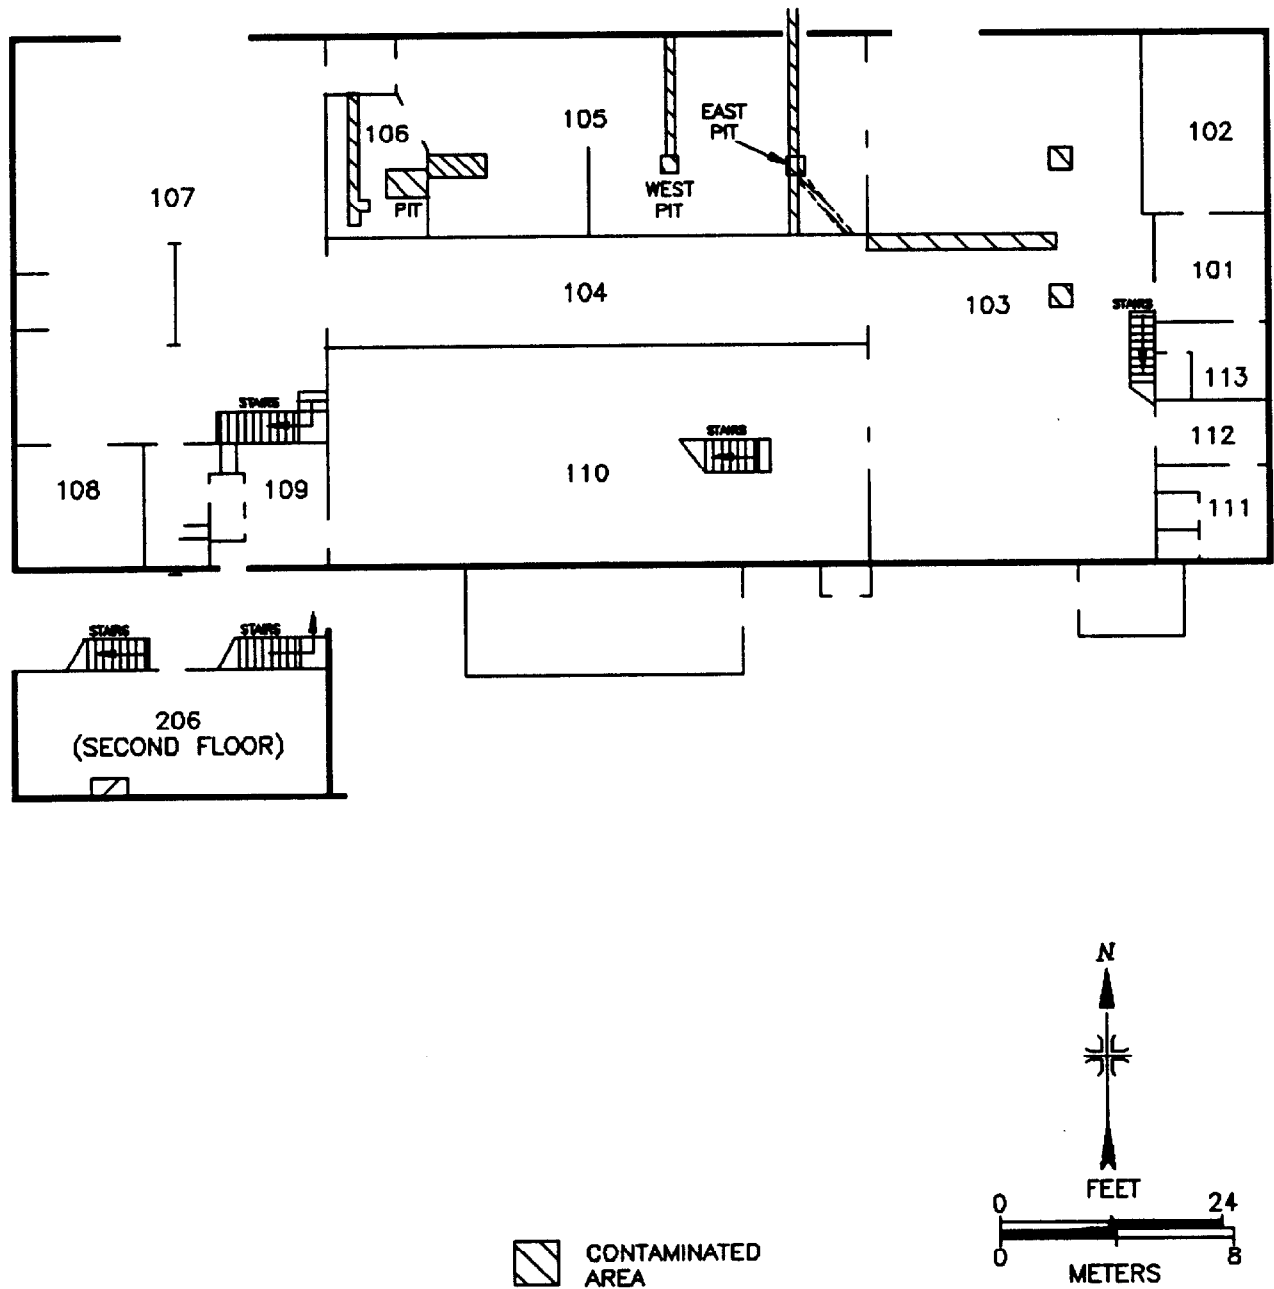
Building 4 Plot Plan, First and Second Floors
